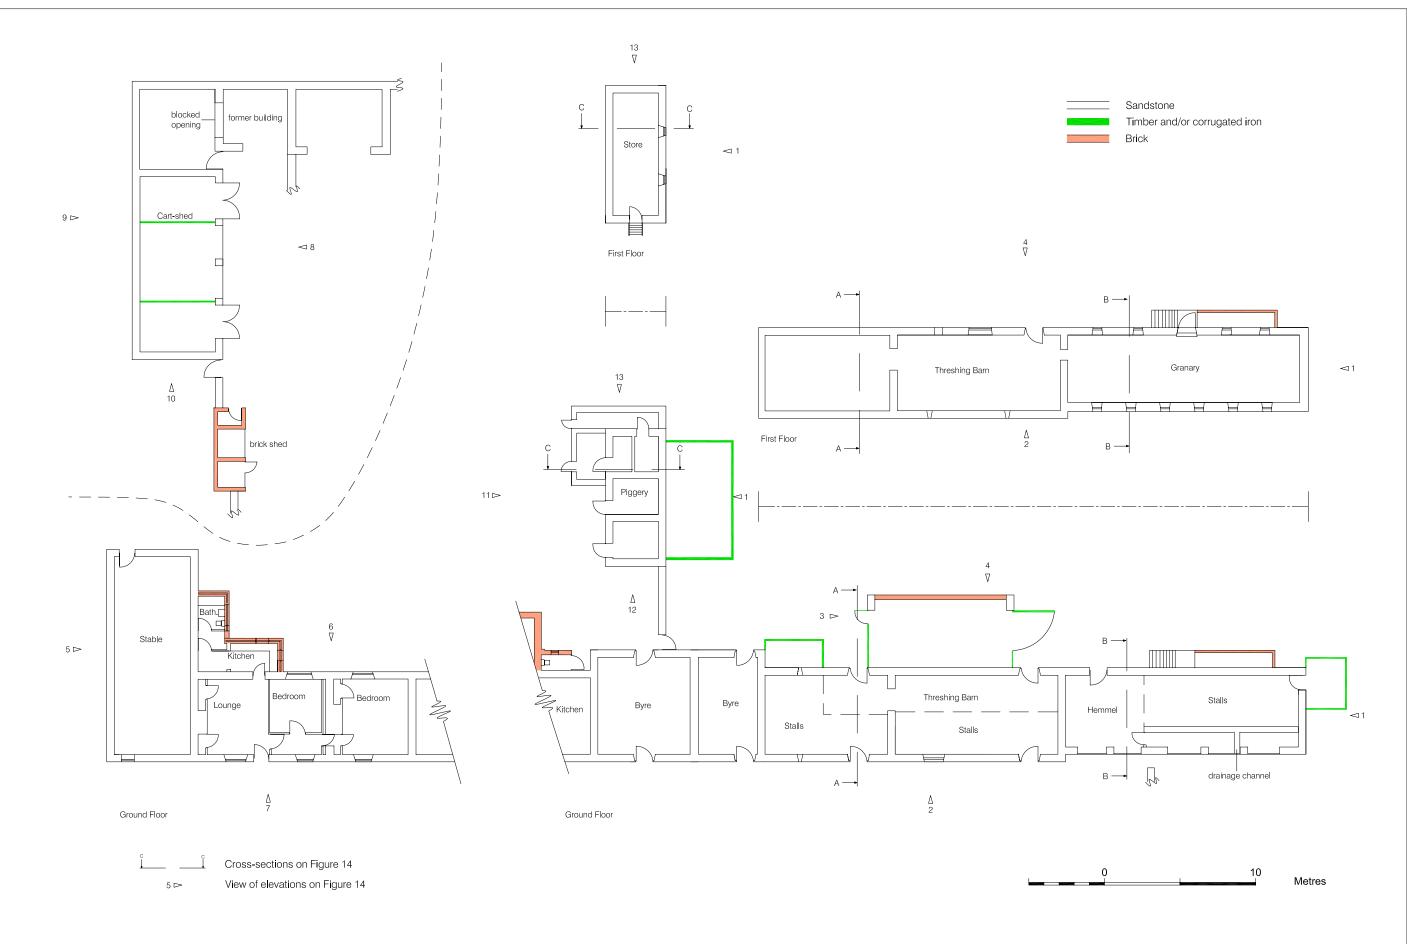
North Brenkley Farm: existing floor-plans Scale 1:250
